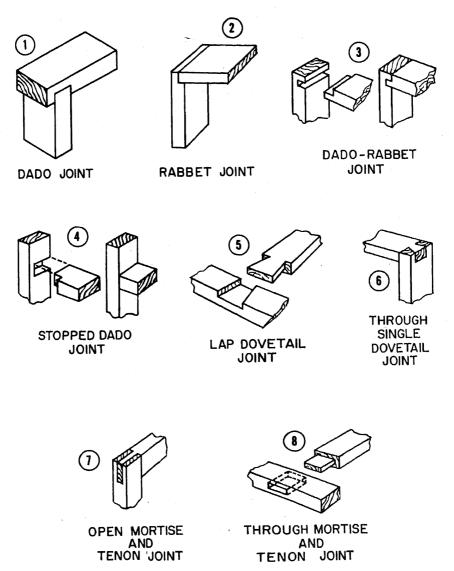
Dado, rabbet, dovetail, and mortise and tenon joints.
